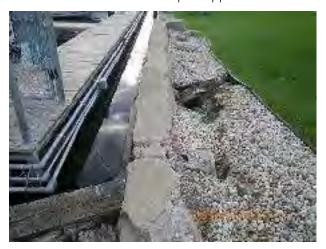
Significant settling at outfall 03-22 (severe damage)
